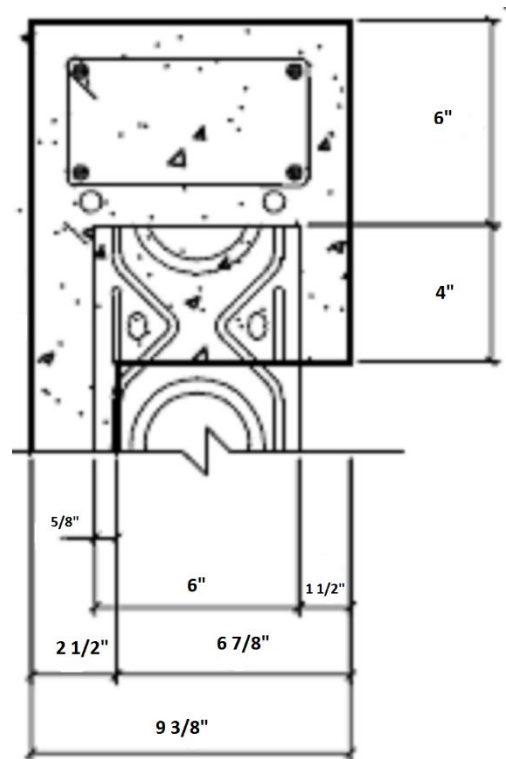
Typical detail at the top and bottom beam (Karimi, 2015a)
